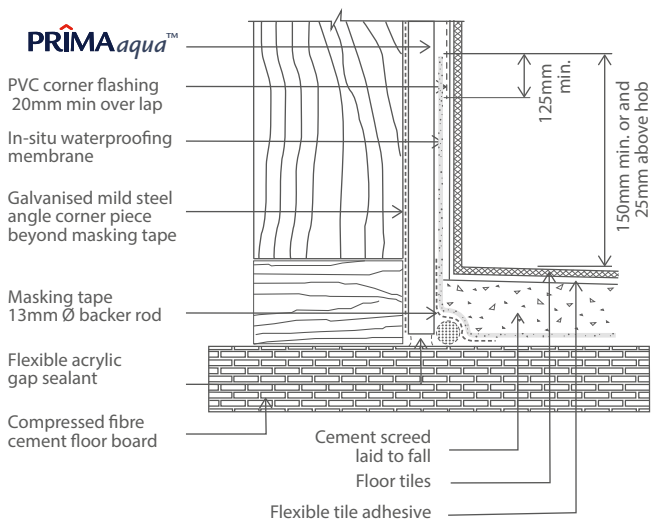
Typical floor/ wall cross-section for cast in-situ internal membrane
